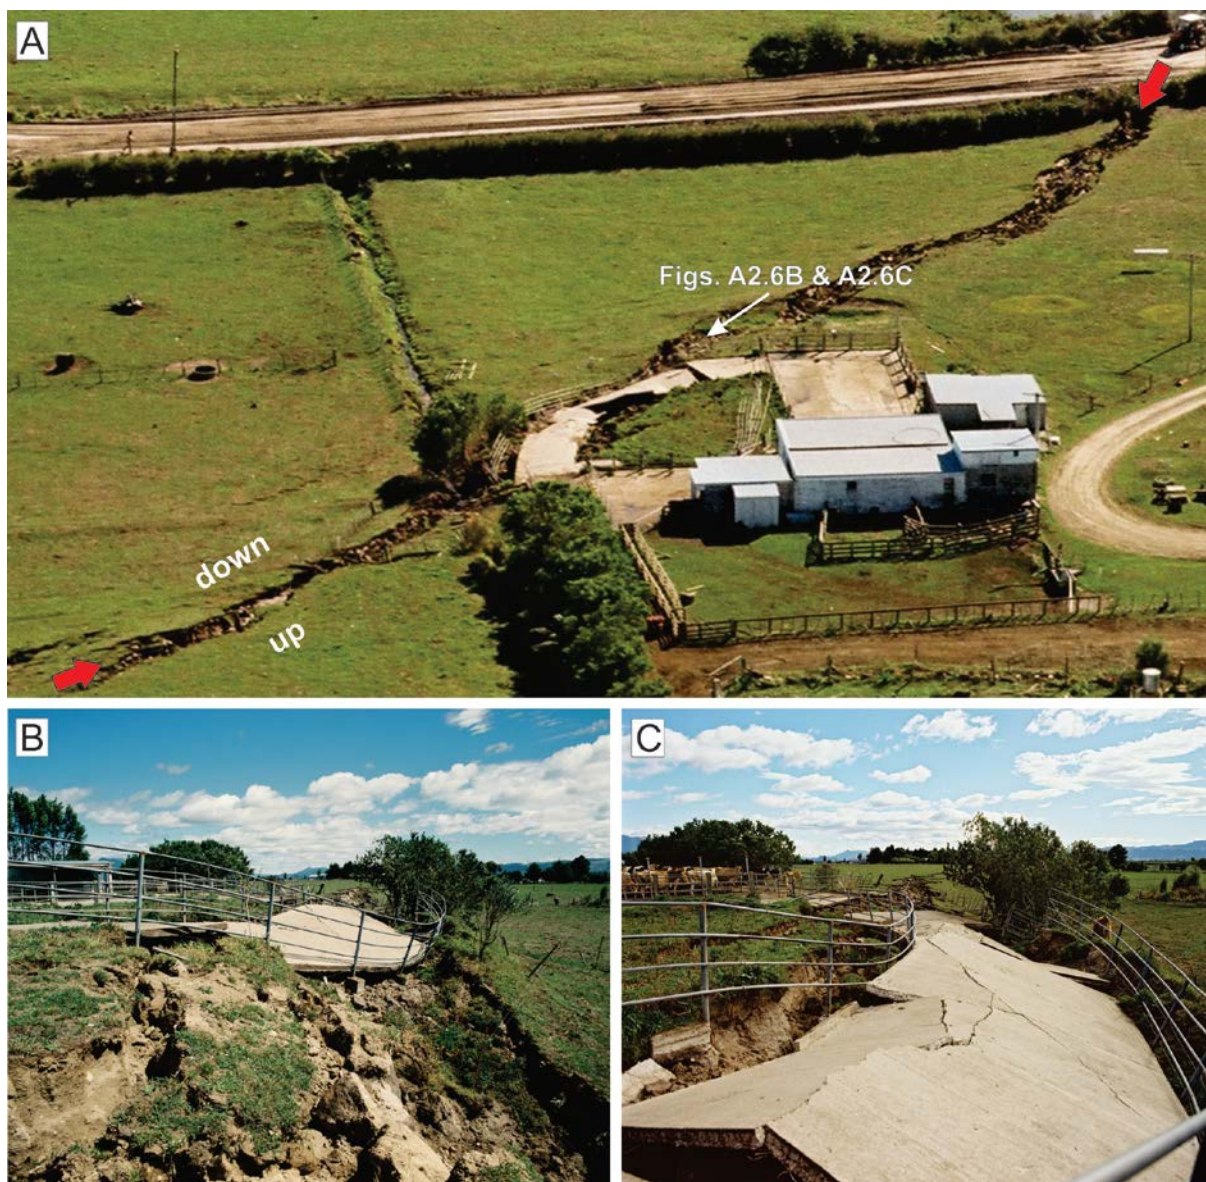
Edgcumbe Fault ground-surface rupture (red arrows) and damage to concrete race of milking shed south of McCracken Road, 1987 Edgcumbe earthquake. (A) Oblique aerial view looking northeast. See Figure A2.3B for location. (B, C) Details of reinforced concrete milking shed race damaged by metre-scale normal fault rupture. Views looking west-southwest. Photos by Lloyd Homer.
